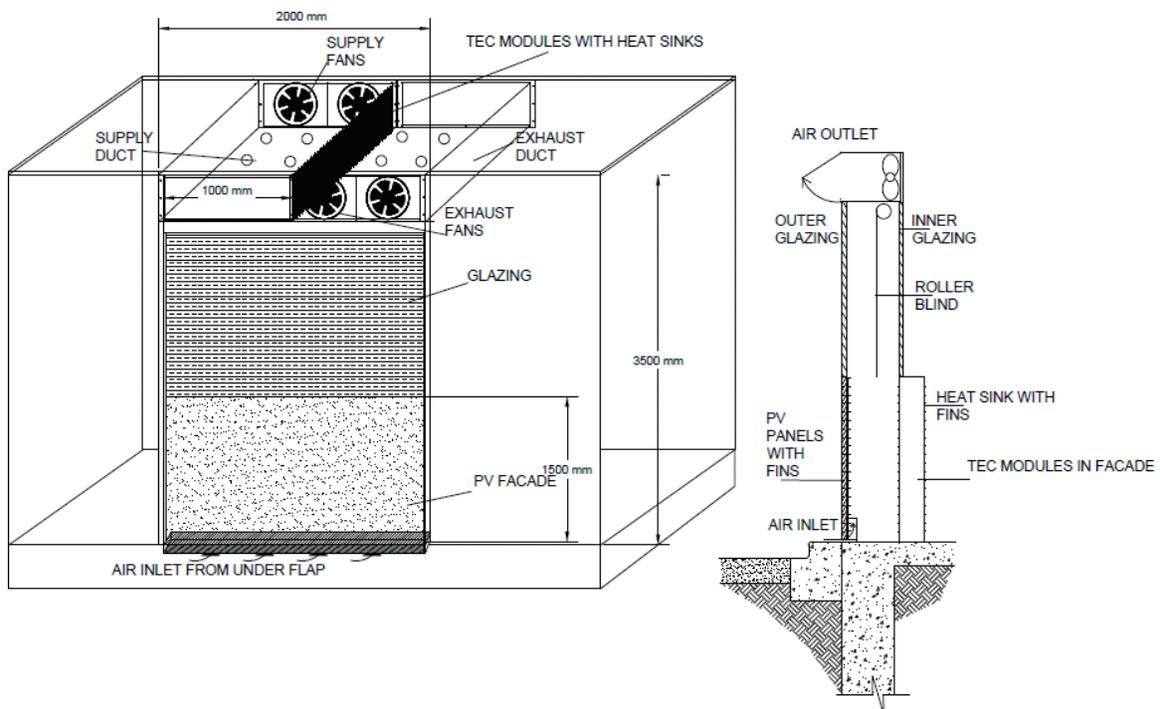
Schematic of a building room zone with TEC modules and PV ventilated façade.
